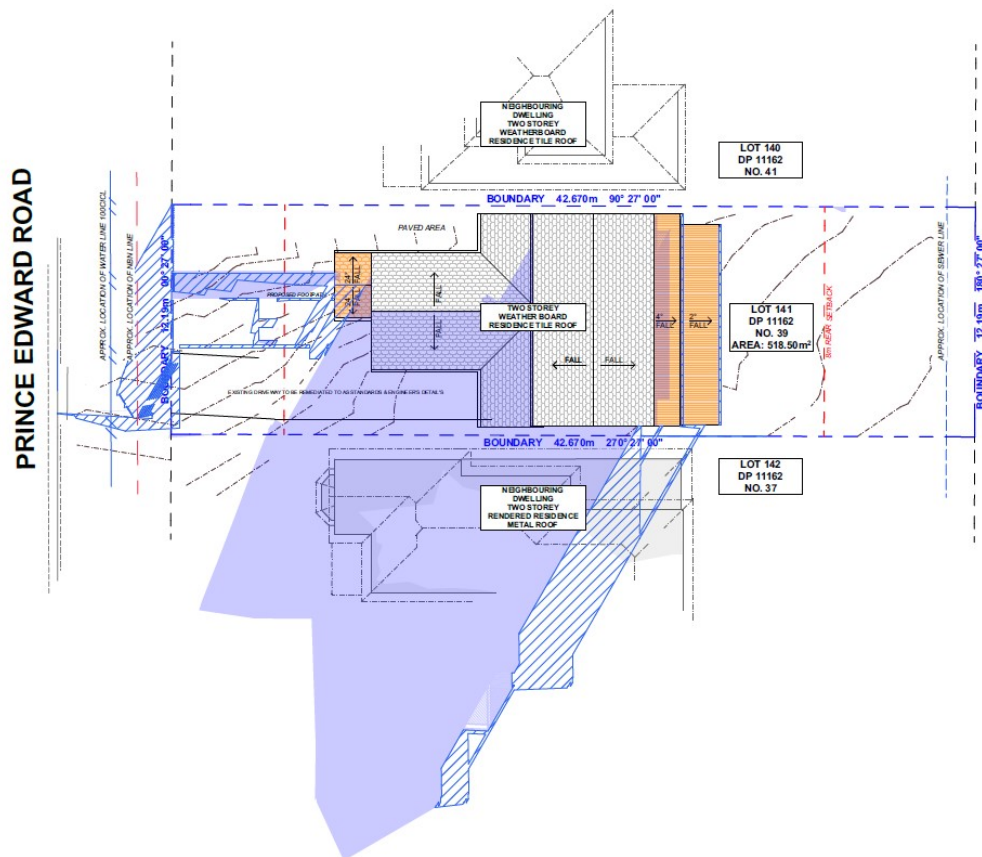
existing and proposed shadowing of 37 Prince Edward Road at 12pm June 21
